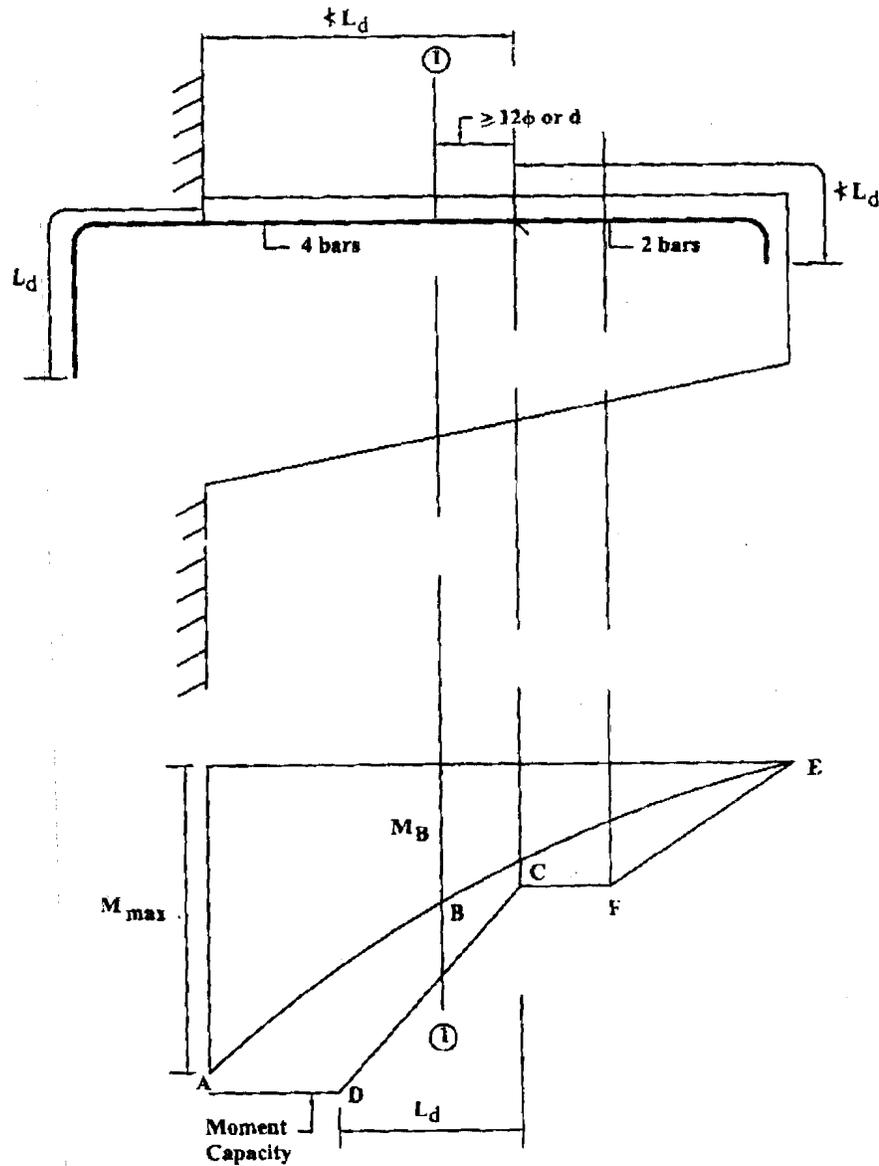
Curtailment of Main Reinforcement of a Cantilever Beam
